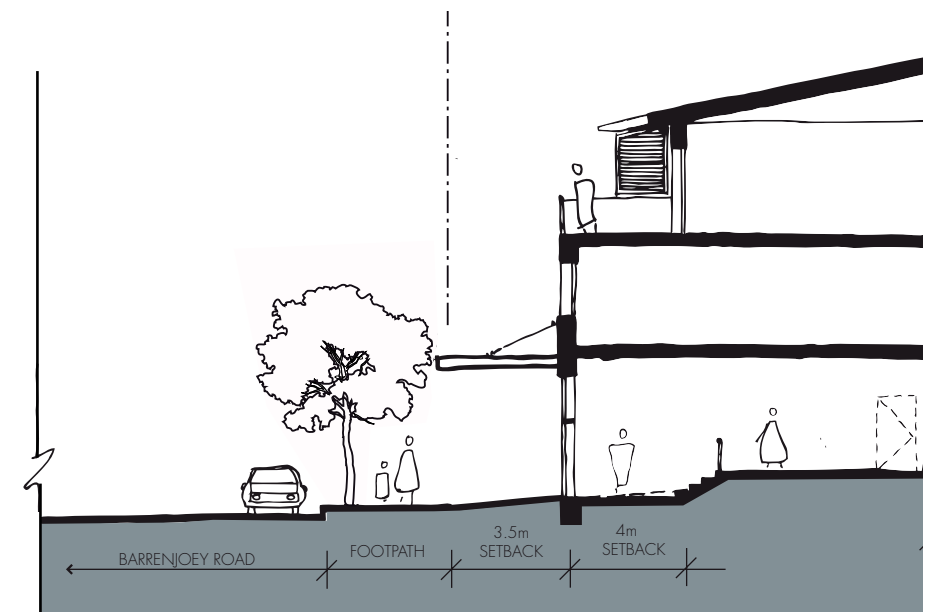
Barrenjoey Road: Ground and first floor building 3.5m setback building line
